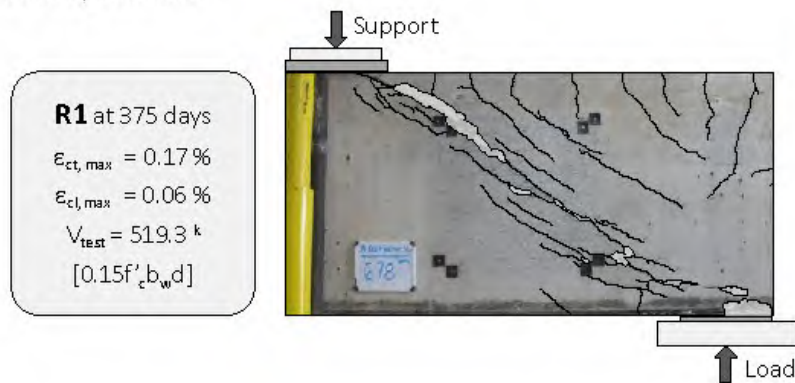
Example of shear crack picture reported by deschenes2009asr
